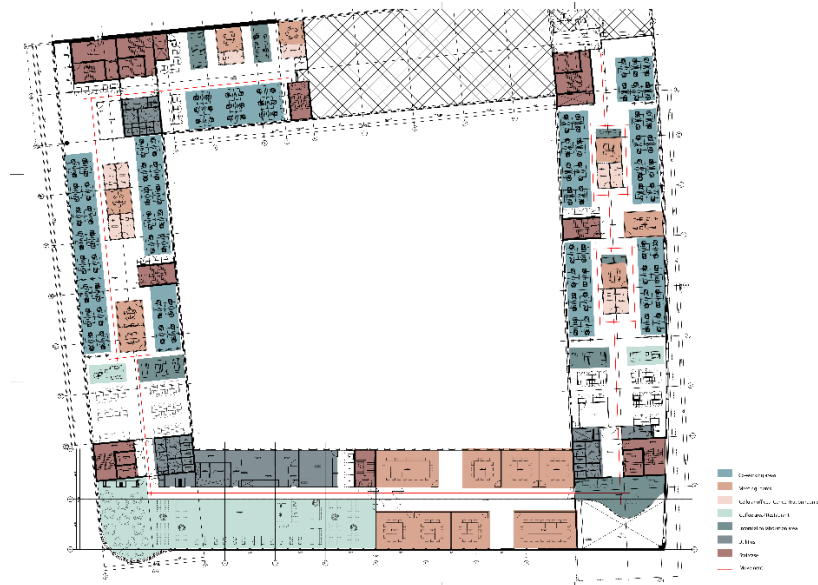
Annotated floor plan of Building 2. First office floor. Source: Netherlands Police Real Estate Department; colour-coding by author.
